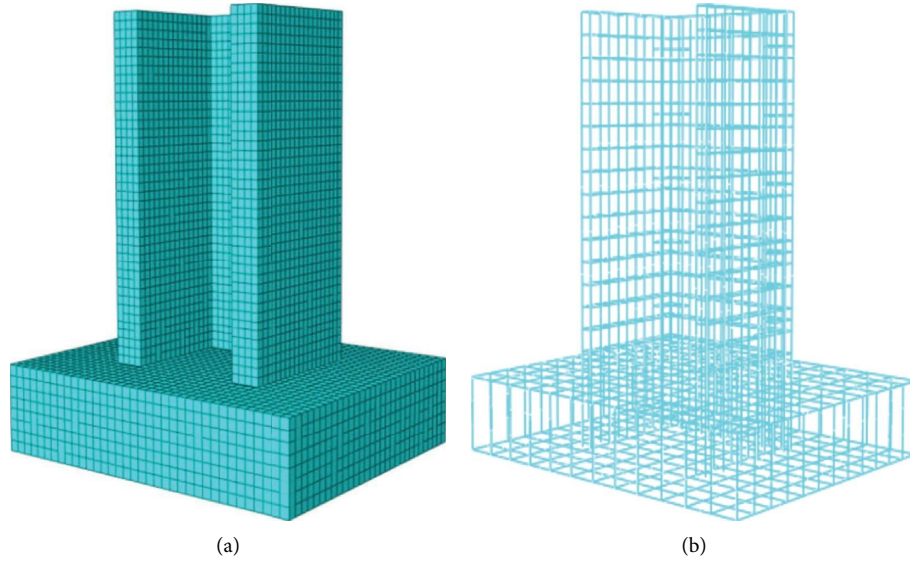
Finite element model. (a) Concrete. (b) Reinforced steel skeleton.
